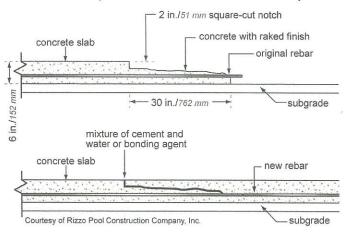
Construction joint (cold joint). Typical overlap for wet or dry shotcrete for an interrupted shoot (not to scale)
